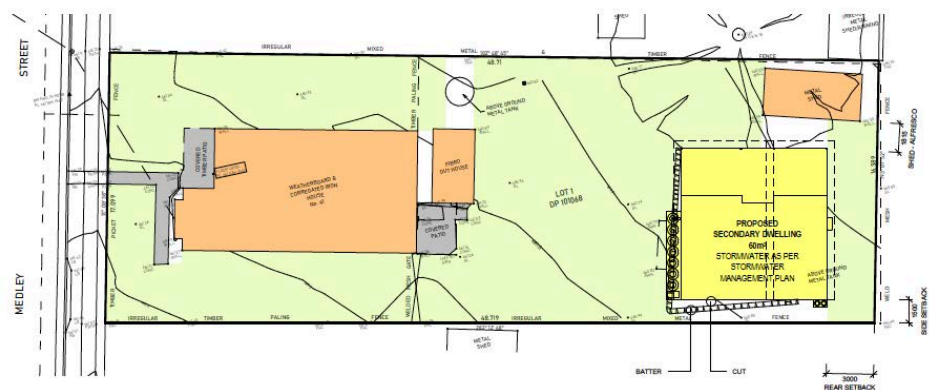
Site plan of 41 Medley Street, Gulgong, indicating the location of the proposed secondary dwelling (indicated in yellow).
